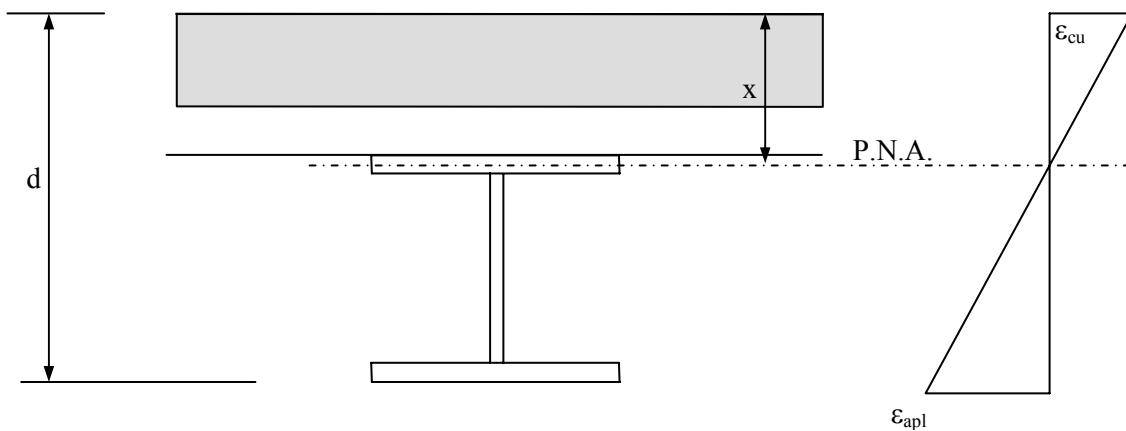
Composite steel-concrete section (P.N.A= Plastic Neutral Axis)
